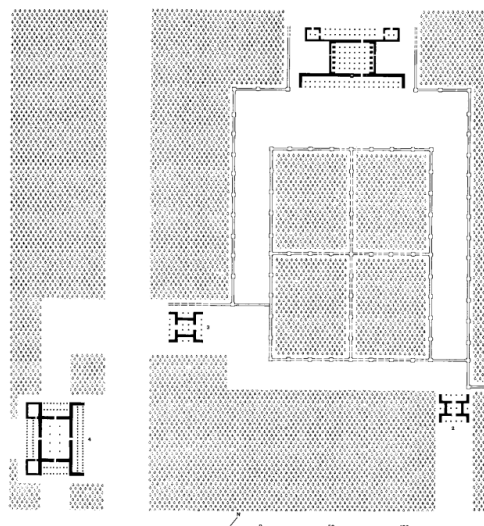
Plan of Pasargadae Garden (Stronach, 1994)
